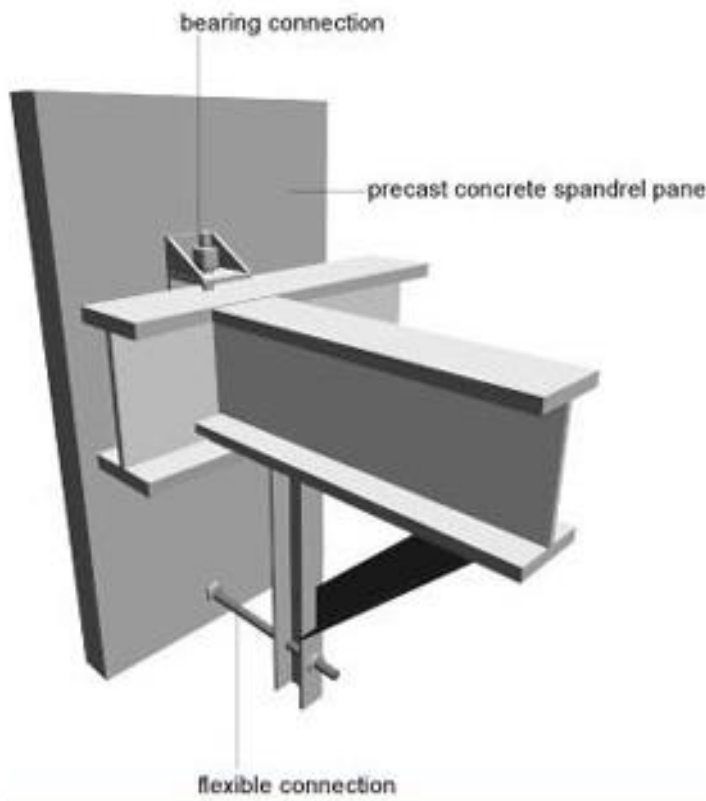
Typical floor-to-floor push-pull panel connections. Each beam has a bearing connection at the bottom of a panel and a flexible, or tie-back, connection for the panel below (Chris Arnold et al, 2009)
